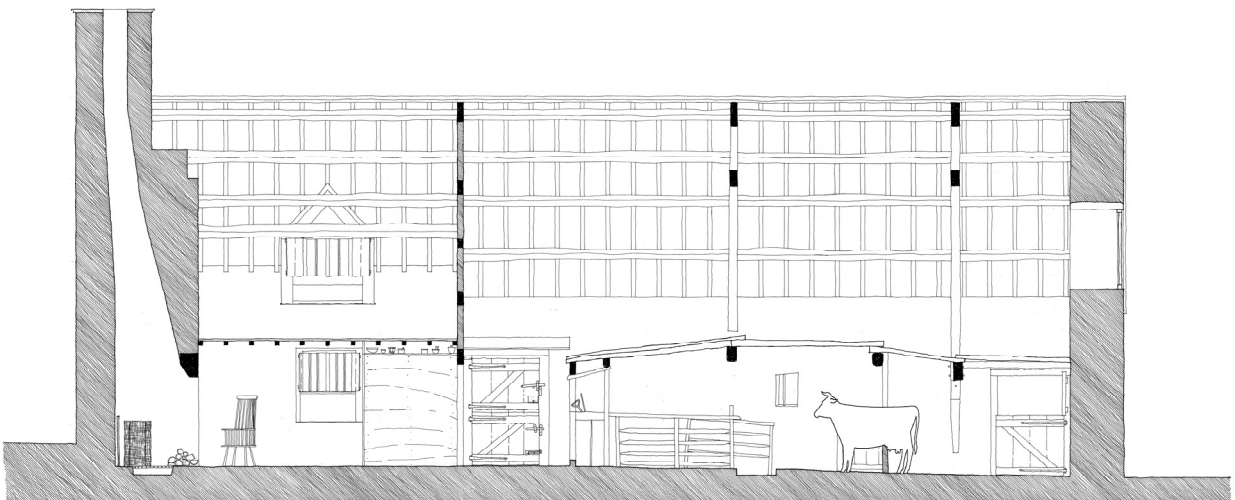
Cruck frame construction with later stone built walls at Cilewent
